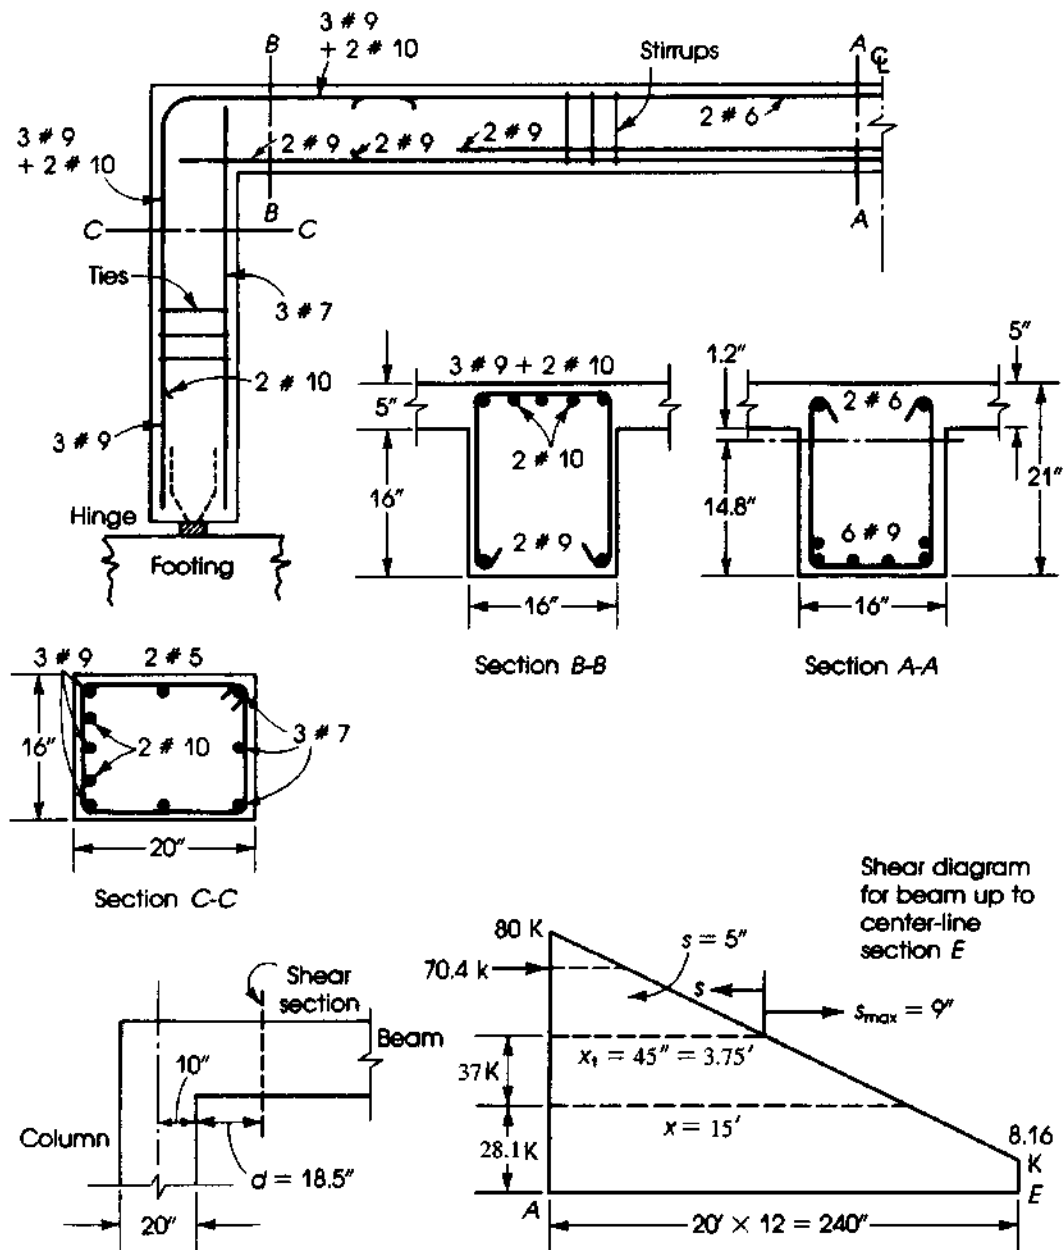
Example 16.2: reinforcement details of frame sections.
